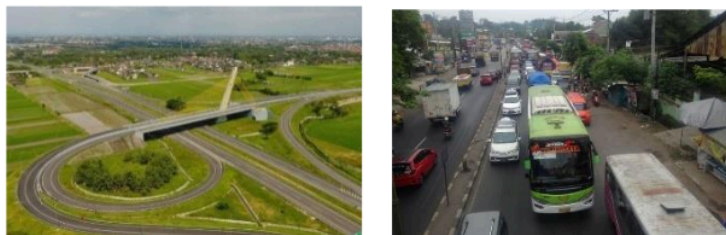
Toll Road (Left), Pantai Utara Road (Right)
